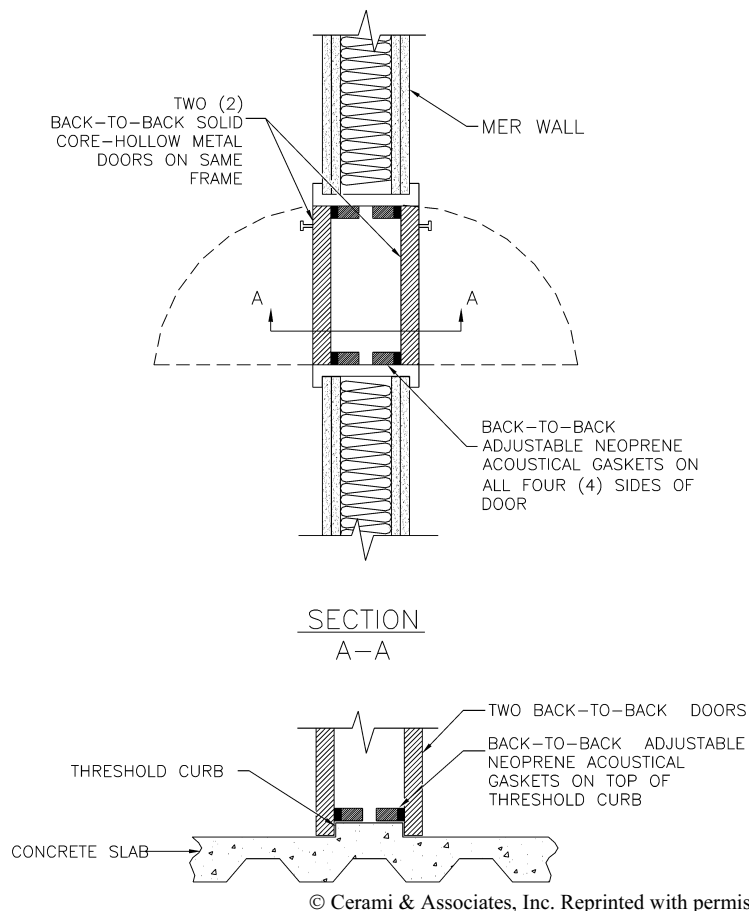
Back-to-back door arrangement for a local floor fan room.
